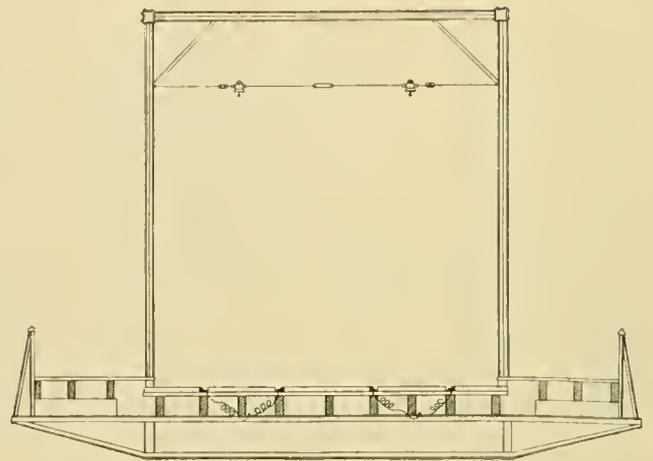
OVERHEAD CONSTRUCTION ON VIADUCT SPAN.
